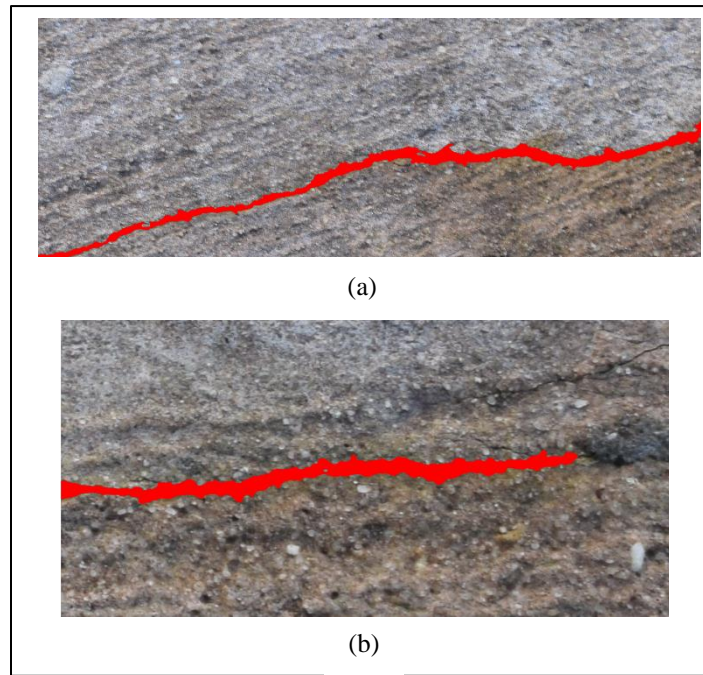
Example of (a) collected and (b) detected concrete crack images.
